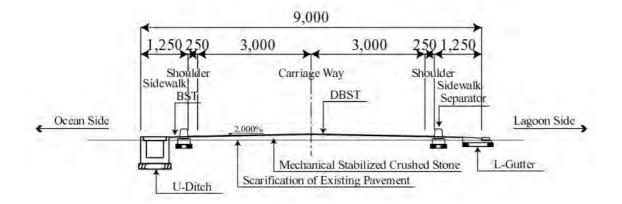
Standard Cross-Section: South Tarawa Road in Bairiki (3)
